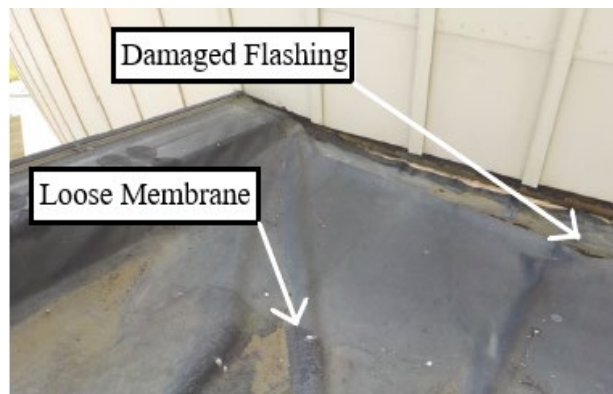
Contract 7734 Damaged Digester Flashing and Membrane
